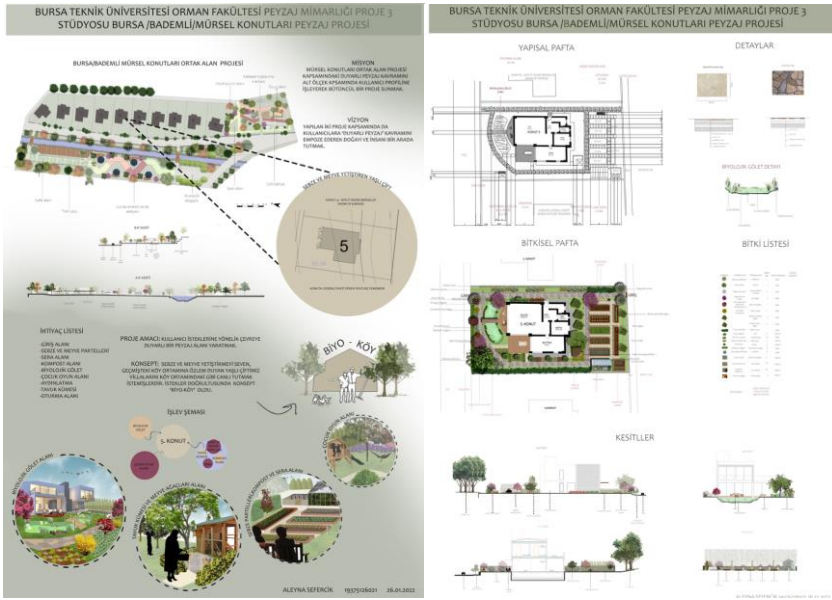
Concept Approach and Technical Drawing Sheets (Muammer Emre Bıyıkçı)
